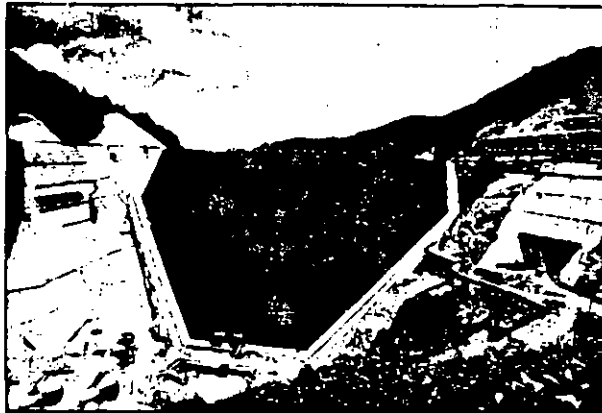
Section showing construction of the Yashio dam impervious membrane.
